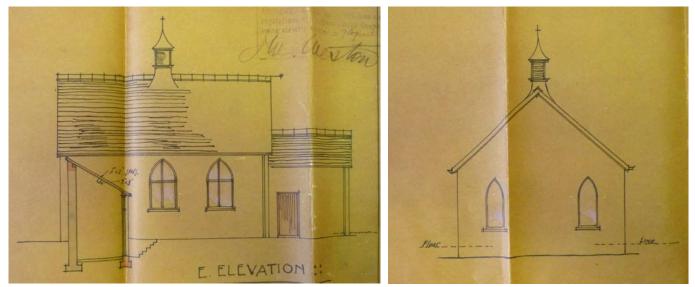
(left): East external elevation from the original drawings of 1923 (CAC(K) WS/RD/SW/Plan 107 1923) Plate 7 (right): South external elevation from the original drawings of 1923 (CAC(K) WS/RD/SW/Plan 107 1923)
